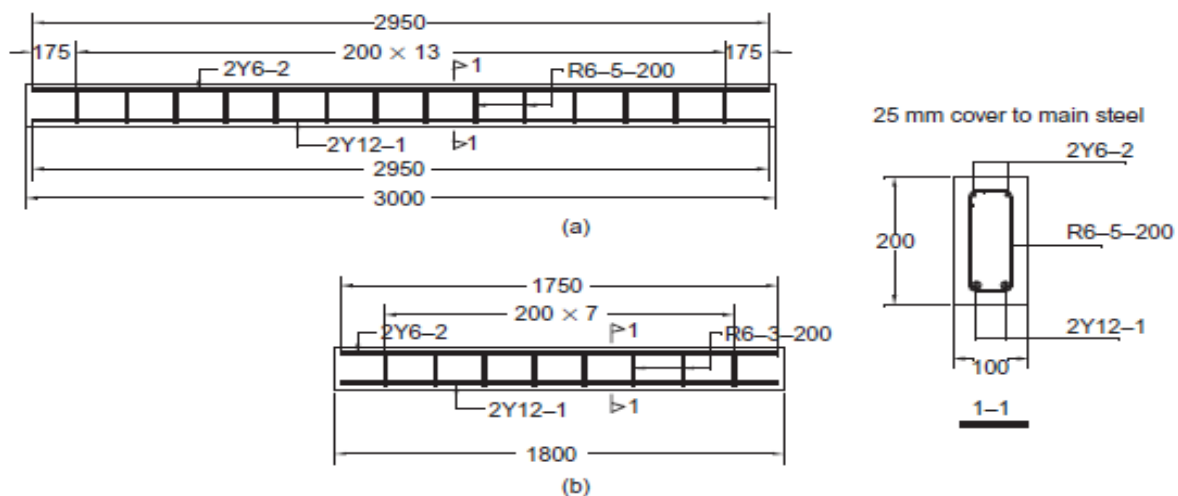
Reinforcement details for: (a) 3.0 m beams; (b) 1.8 m beams (Chen & May, 2009).
